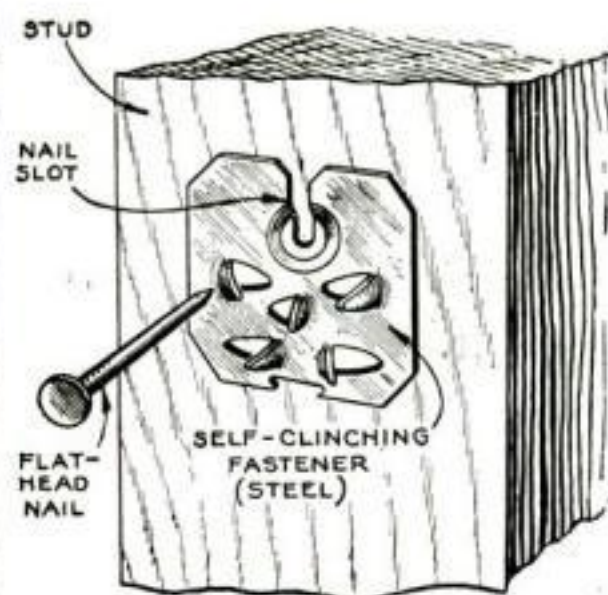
Special fasteners may be used to hold the centers of the panels in place.
